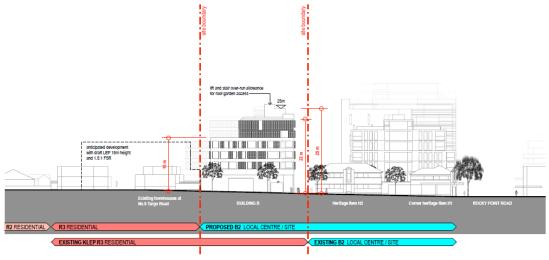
Indicative Scheme - Ramsgate Road Elevation. (Source: Turner Studio, August 2019)
